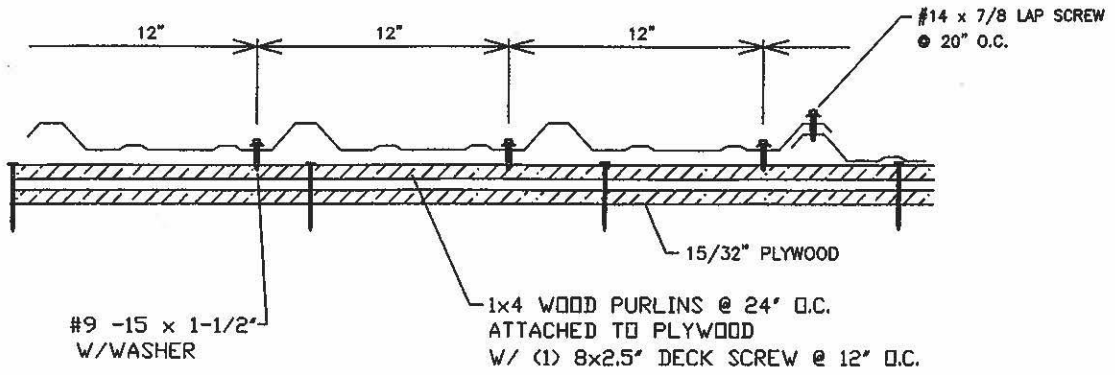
PBR Panel Detail (12-12-12 Fastener Pattern)
